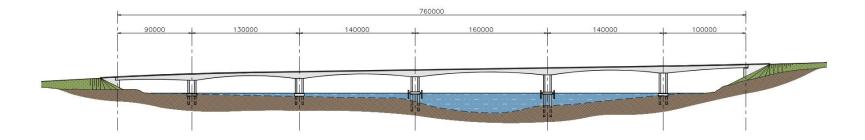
Highest ranked option: a concrete box girder bridge adjacent to existing crossing alignment (Option 2A, looking north)
